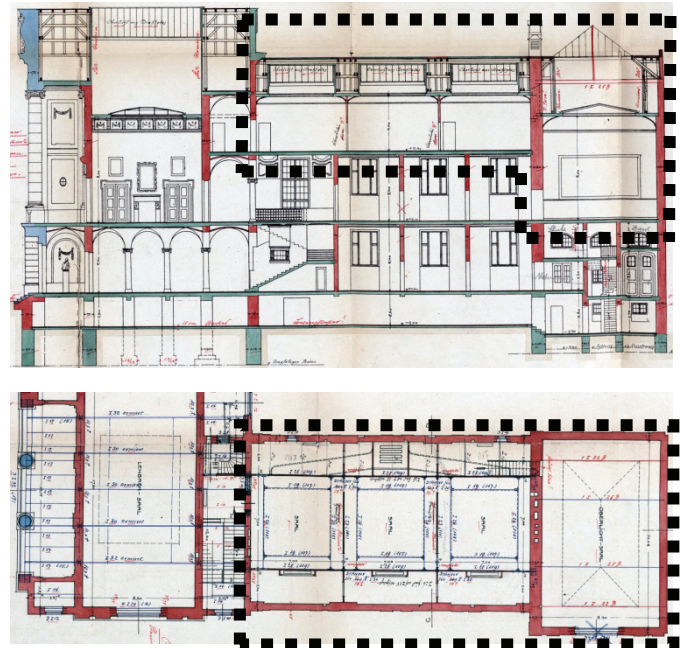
Section of the Collection Schack showing the second floor attic galleries, which are to be refurbished (non-scale division)
